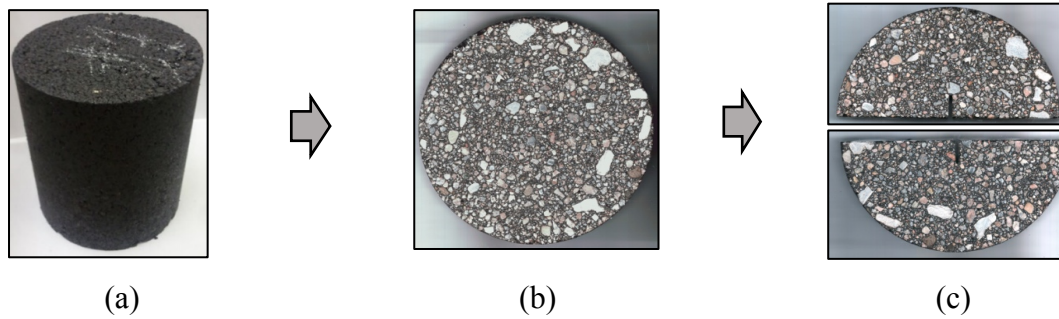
SCB specimen fabrication process: (a) compacting, (b) slicing and (c) notching.
